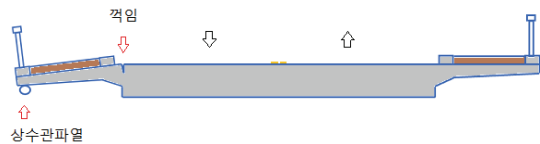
Rupture of Sidewalk at PSC Slab Bridge
